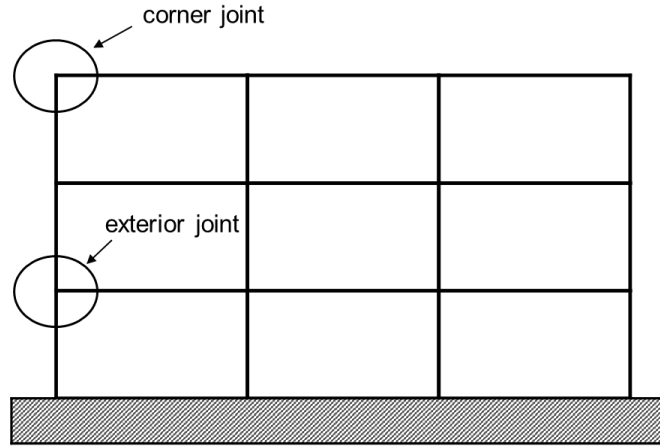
Exterior and corner joints [figure after Wallace et al. (1998)]
